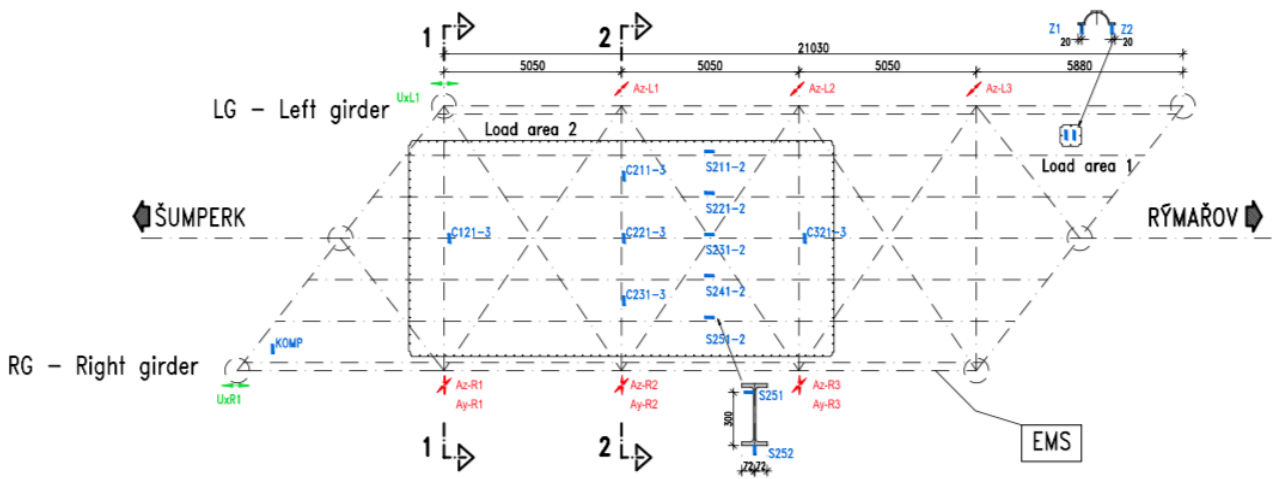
Monitoring Plan: Plan View (Not to Scale).
